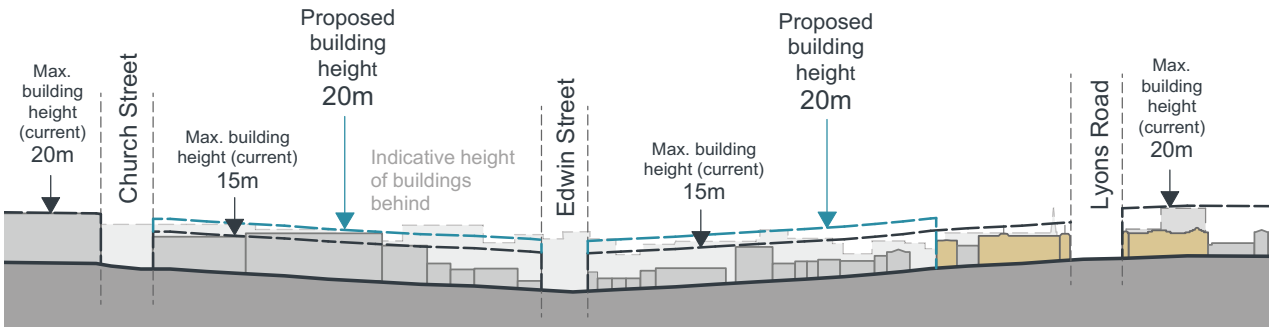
Sectional view of the western side of Victoria Road with proposed building heights
